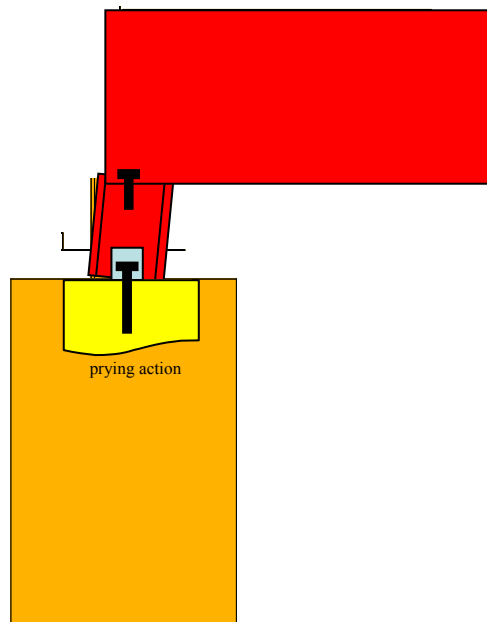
Prying-action of stainless steel stud anchor bolts causing spalling or crushing of surrounding concrete
